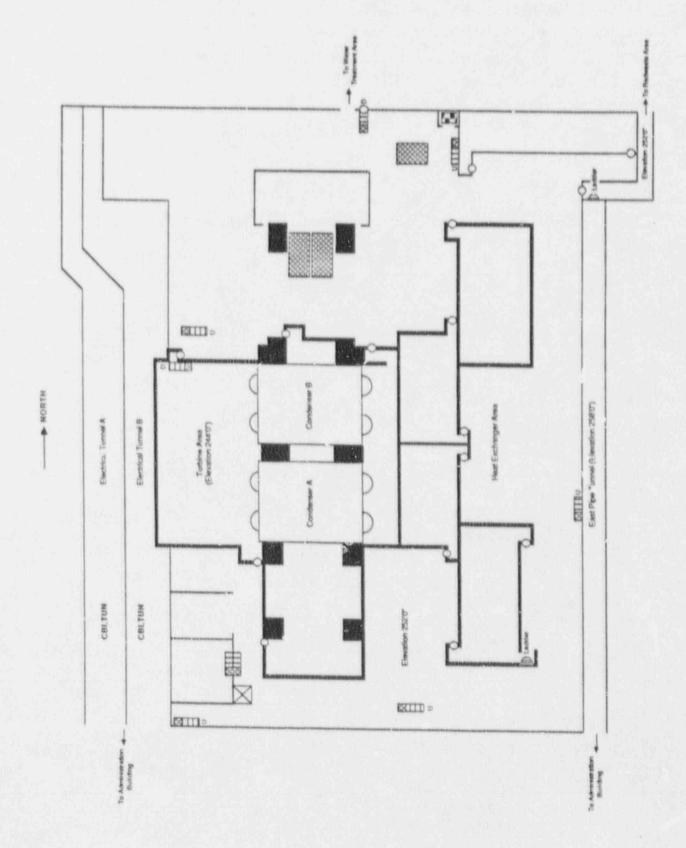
Turbine Building, Elevation 244'0" to 258'0"
